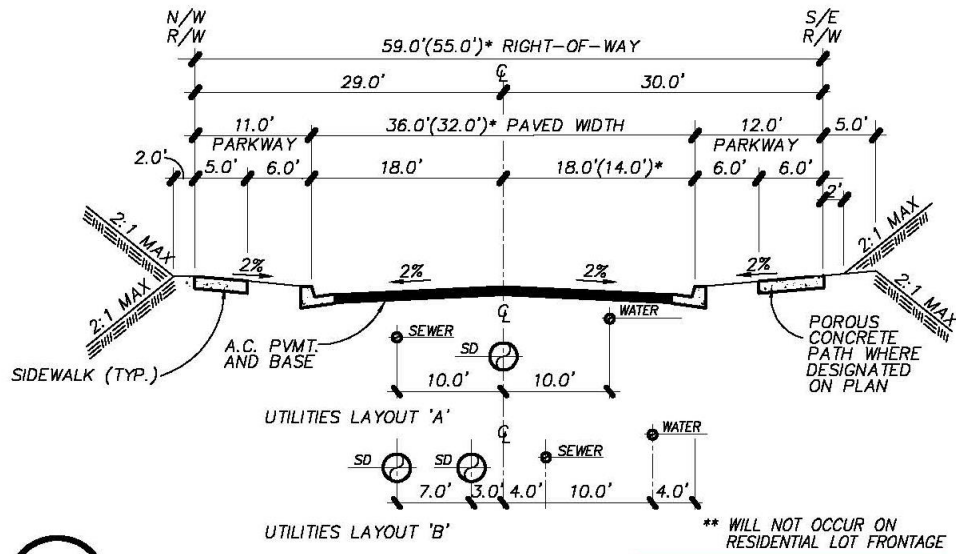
Street Section 8a- Modified Residential Collector (55' – 63' ROW)
